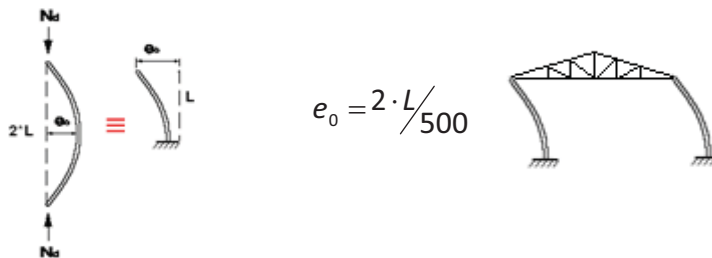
Imperfection  $e_0$  used in battened built-up columns
